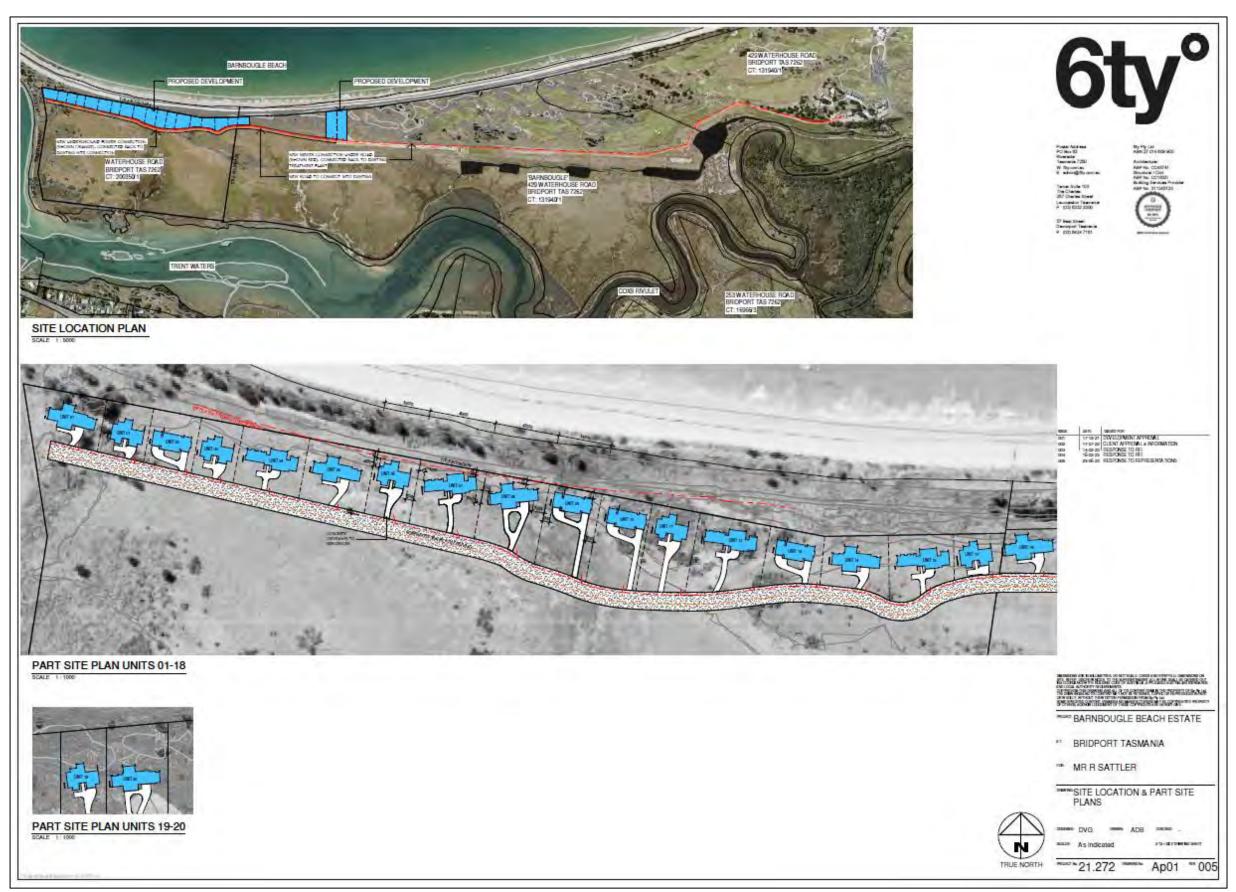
Revised Site plan of proposed visitor accommodation units (source: 6ty Degrees 2023)
